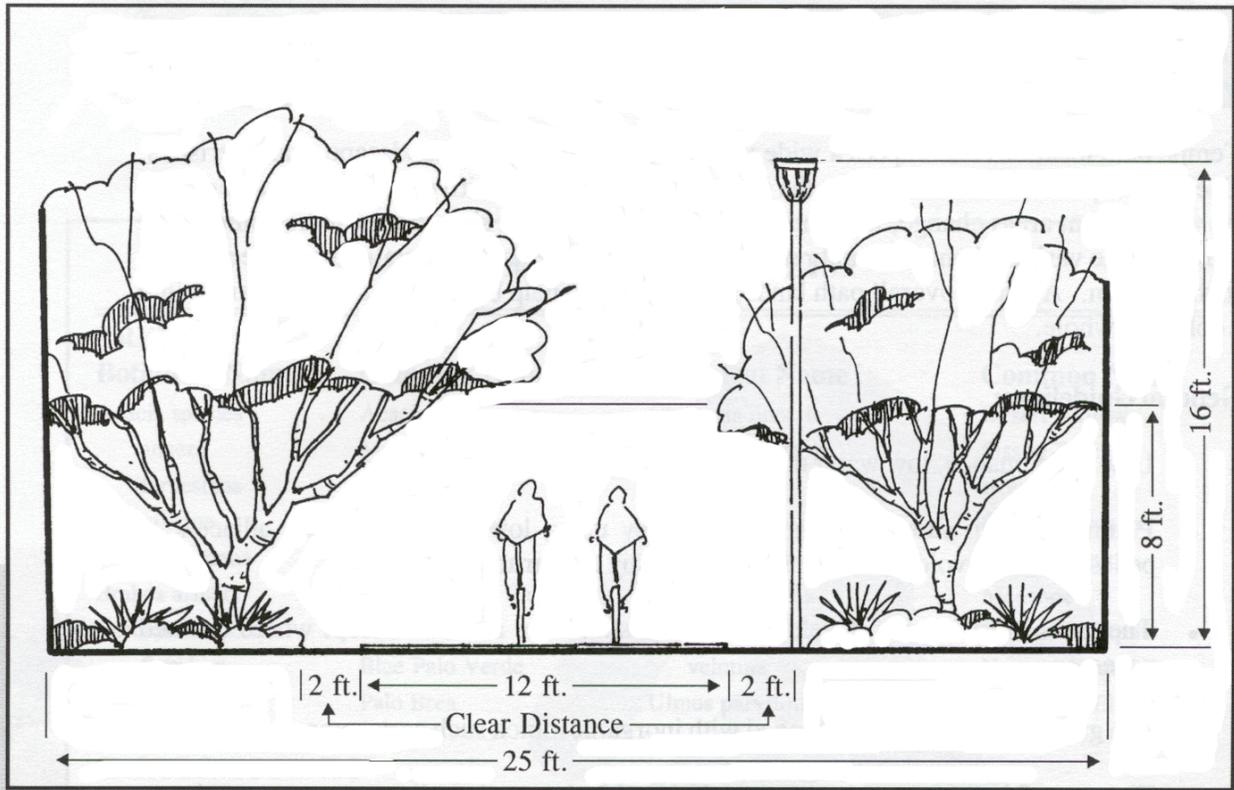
Recommended Path/Trail Section, Provided by the Tempe Multi-Use Path System Detailed Plan.
